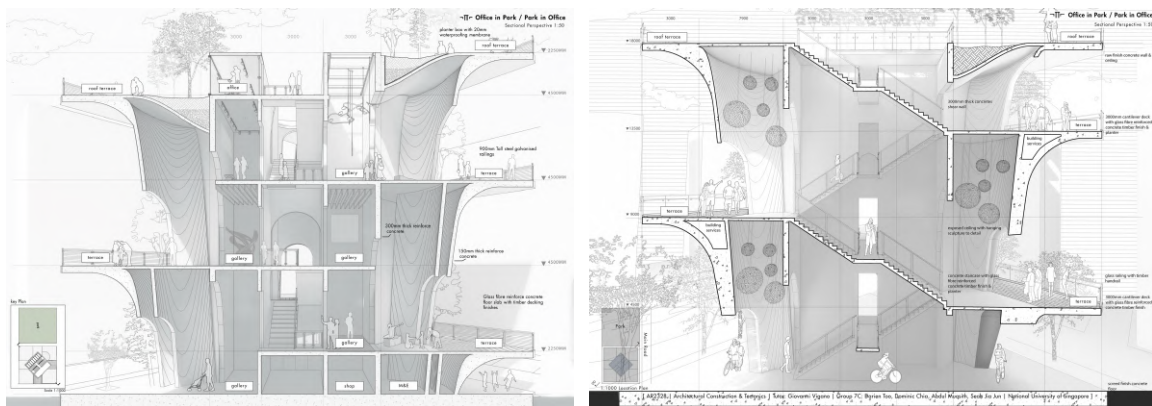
Section perspective drawings as 1/50 (RC frame structure - wall type)
